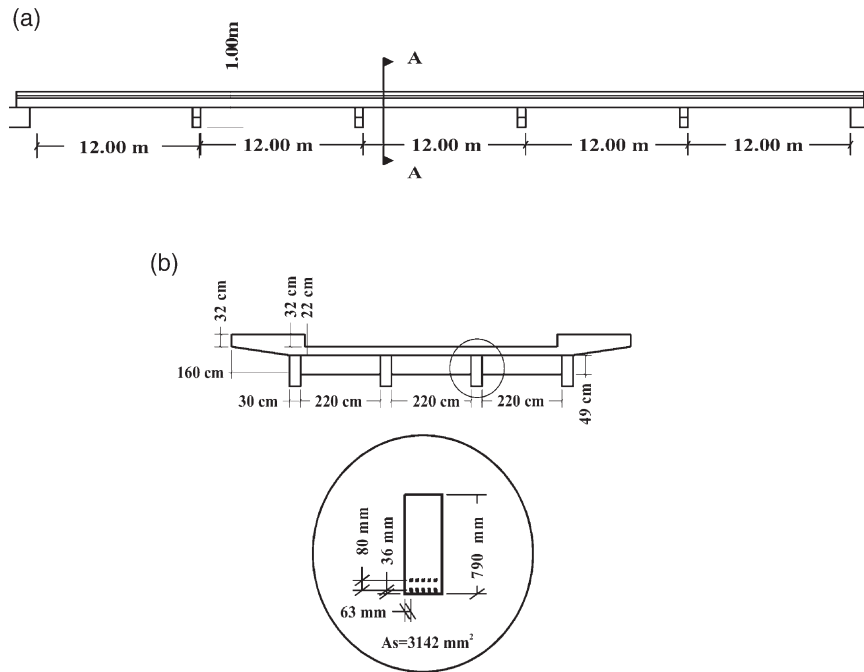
Concrete T-beam bridge (a) profile, (b) cross section A-A.
